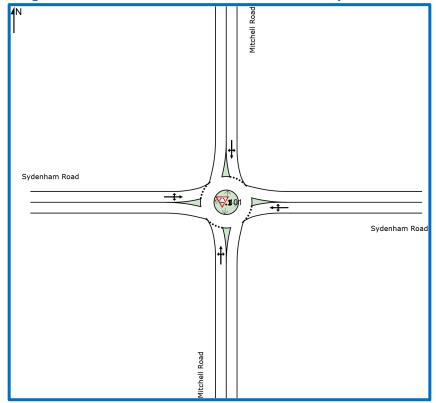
A: Roundabout of Sydenham Road with Mitchell Road SIDRA)
